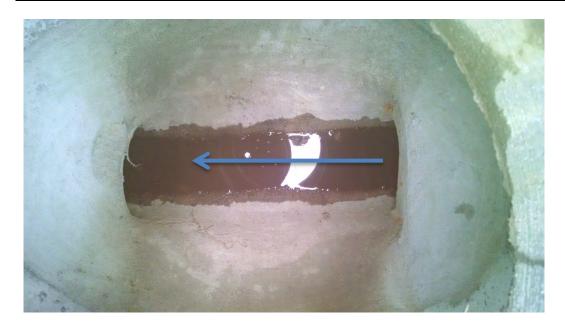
Webber outlet 12 inch RCP pipe. Arrow shows direction of flow towards Shingle Creek.
